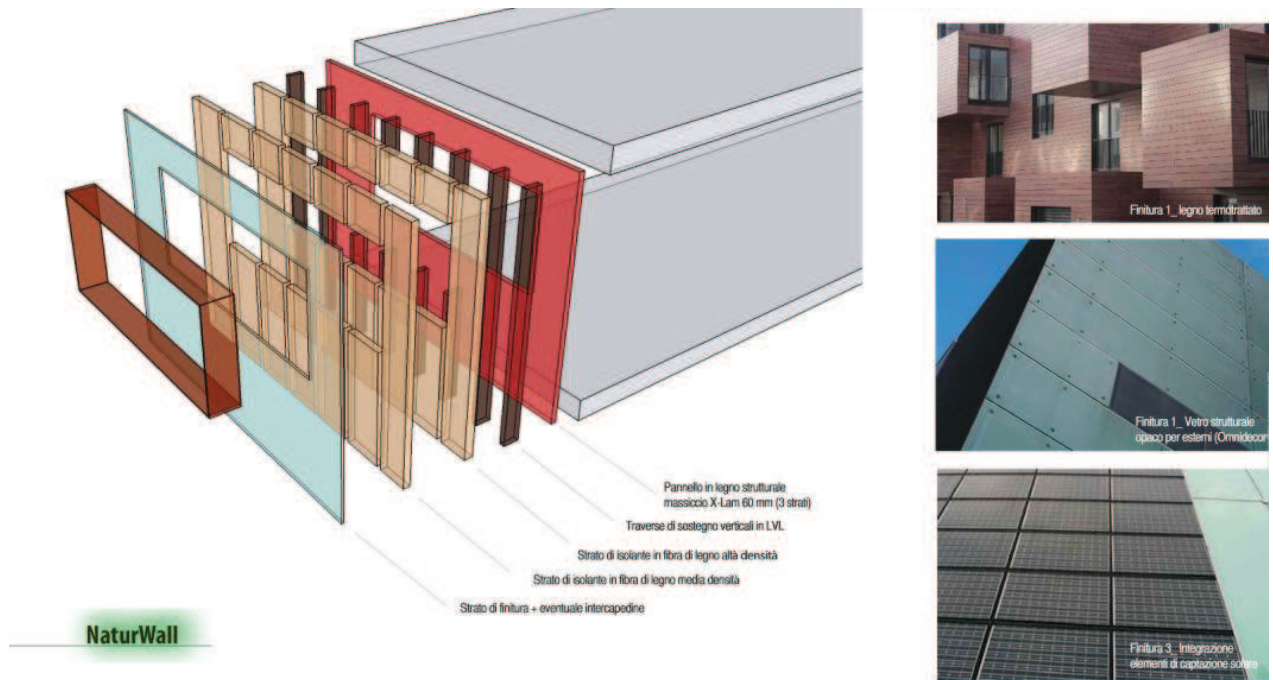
\_ Outline schema of Naturwall wood prefab system for refurbishment of existing buildings
